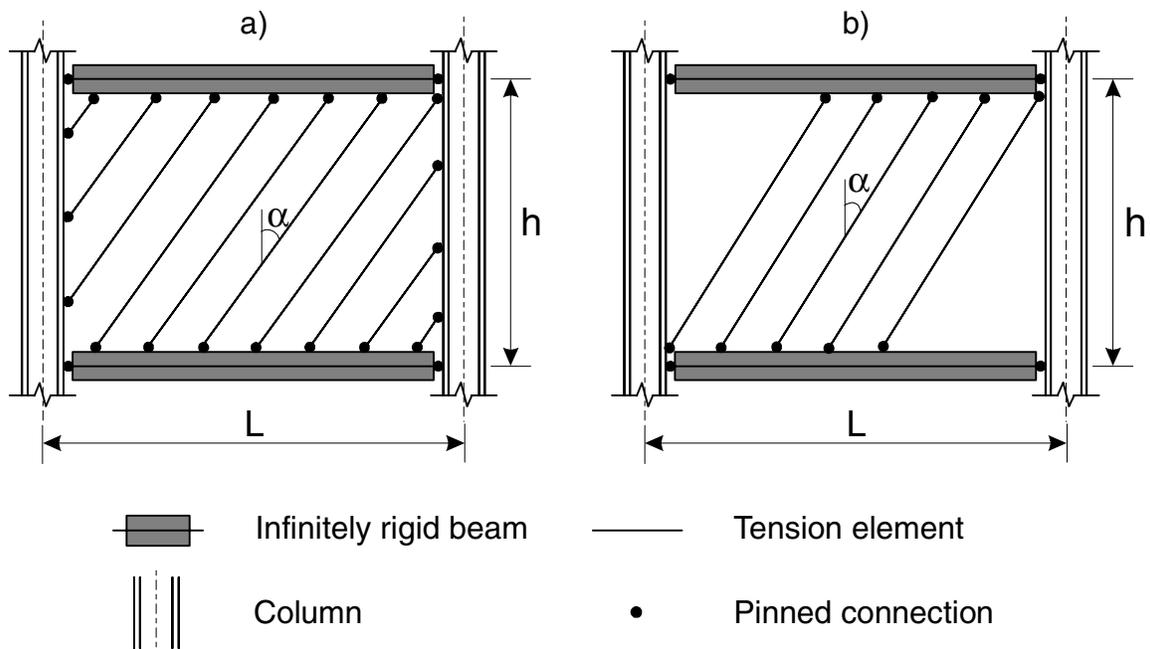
Strip model representation of a typical steel panel developed by Thorburn et al. (1983) a) complete tension field b) partial tension field
